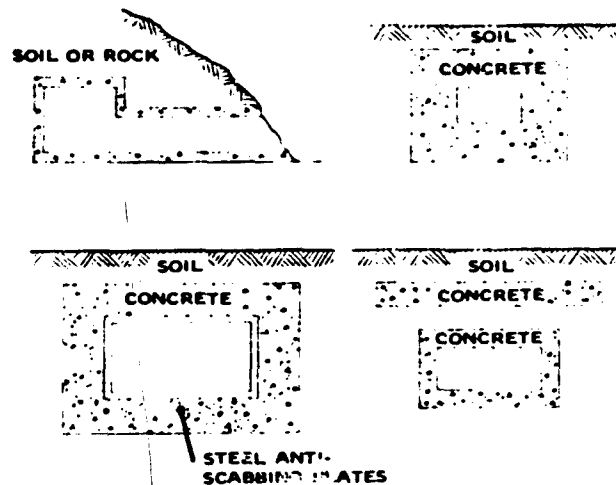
Elevation Views of Bomb-Resistant Structures.
